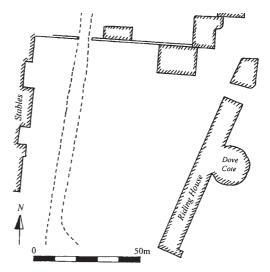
Halswell House, Goathurst. Plan showing the dovecote occupying the site of the unfinished riding house (courtesy James Brigers Prospect Archaeology)
